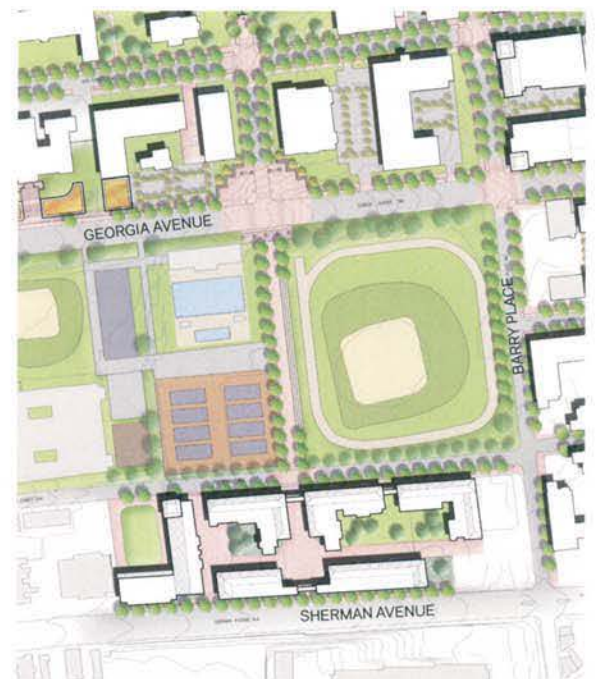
Plan view of proposed Gateway at Howard Place and Georgia Avenue
